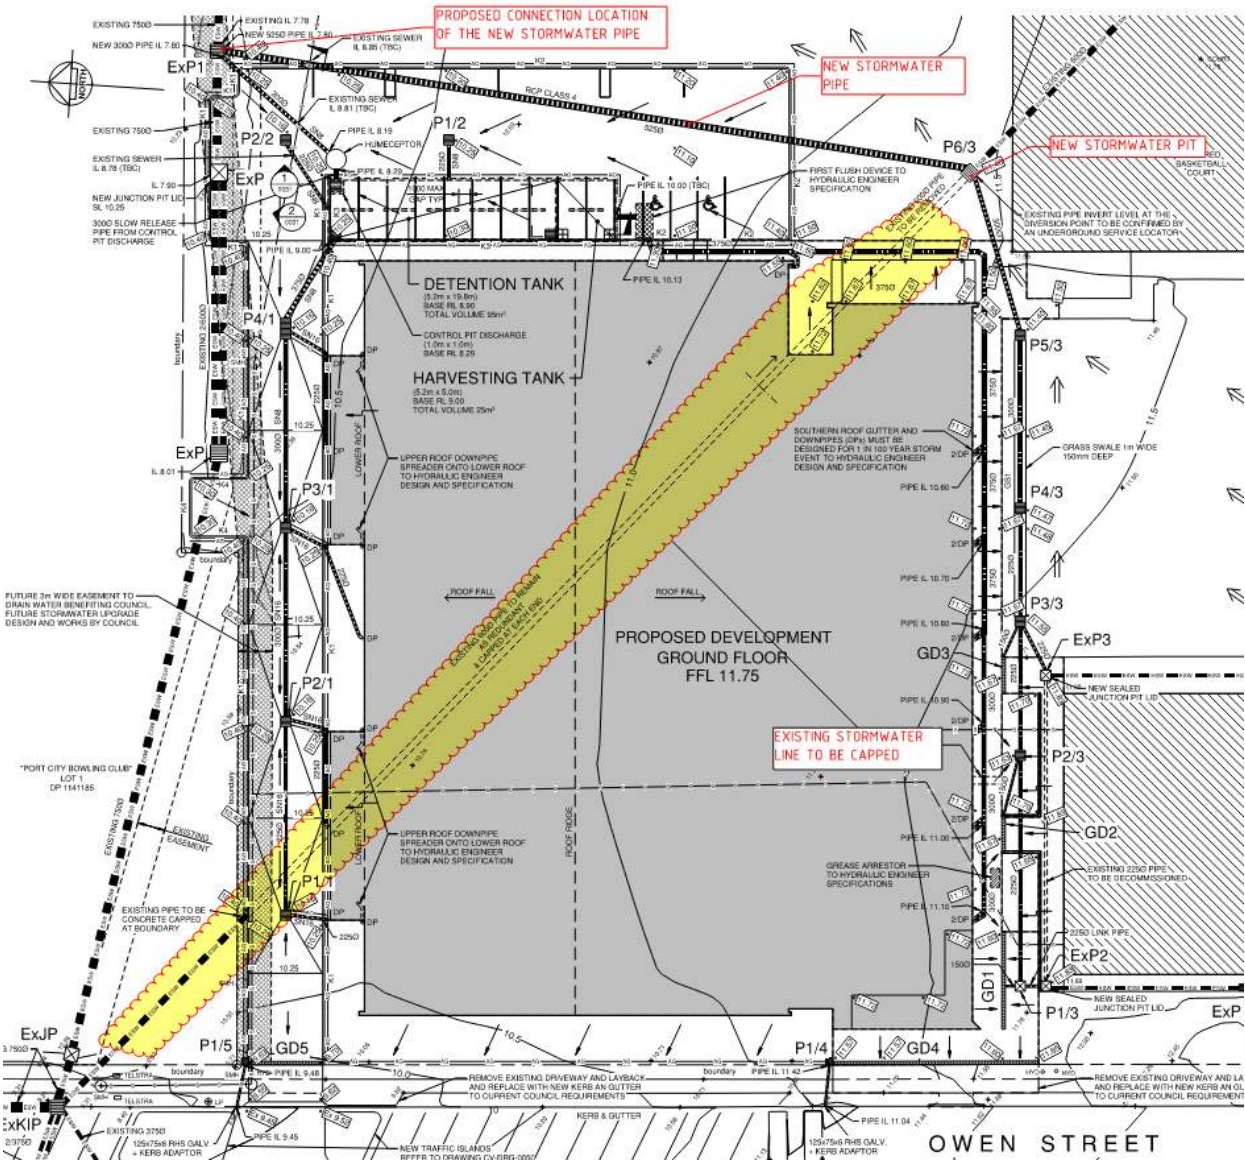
Stormwater Pipe Diversion – Current Design by MPC
